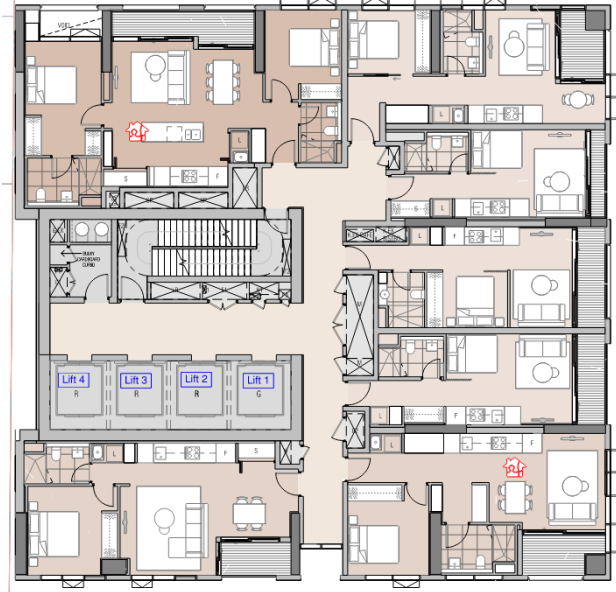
Lift locations and numbering, ref: DA-107-Level 07-22 - Floor Plan Rev. A
